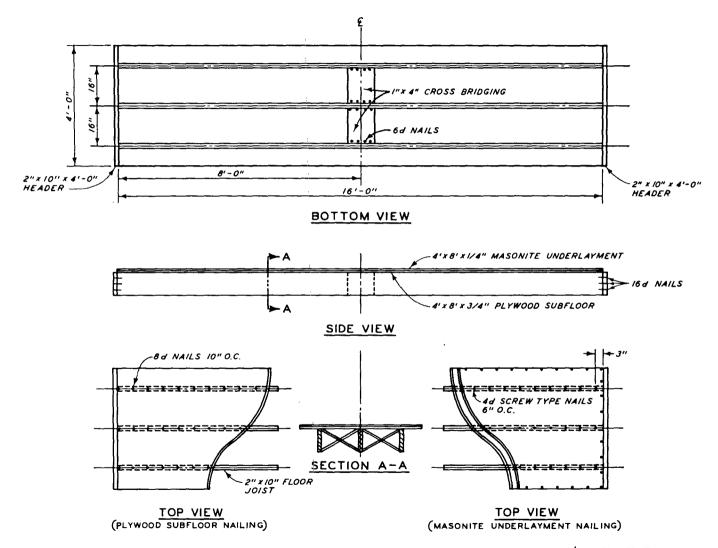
Construction drawing for the unreinforced test specimens (I, V, VII, XIV, and XV).
